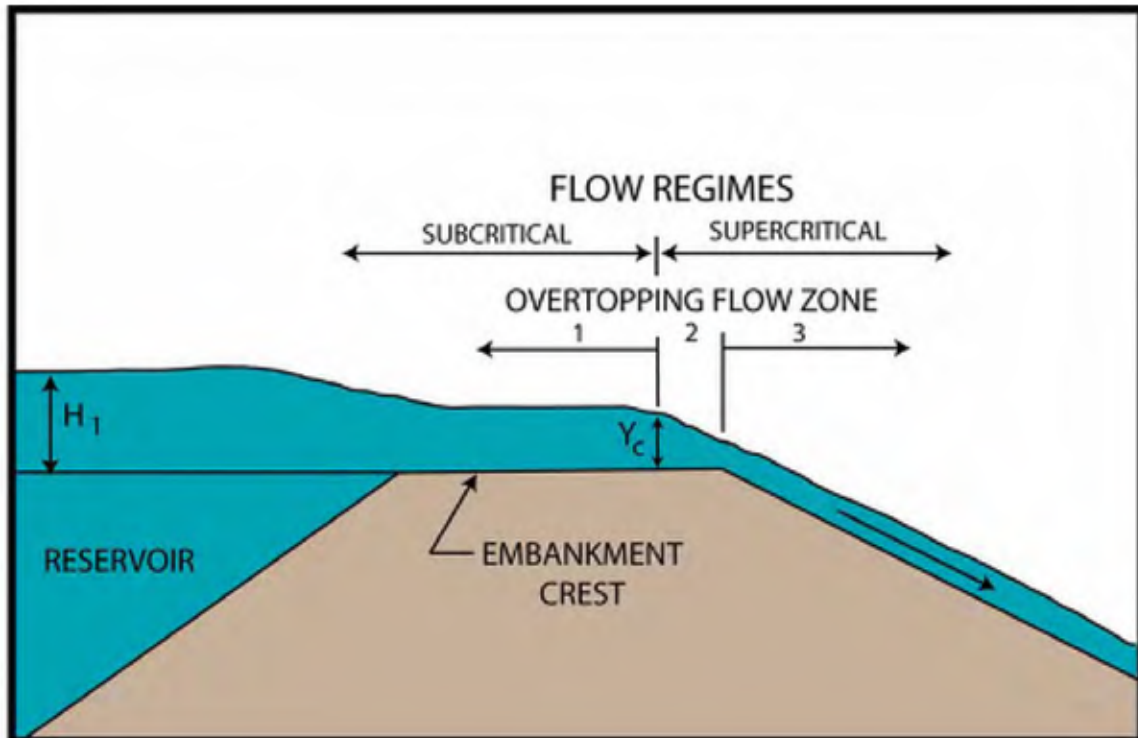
Flow regimes leading to failure of embankments in riverine flooding situations (after Clopper and Chen 1988).
